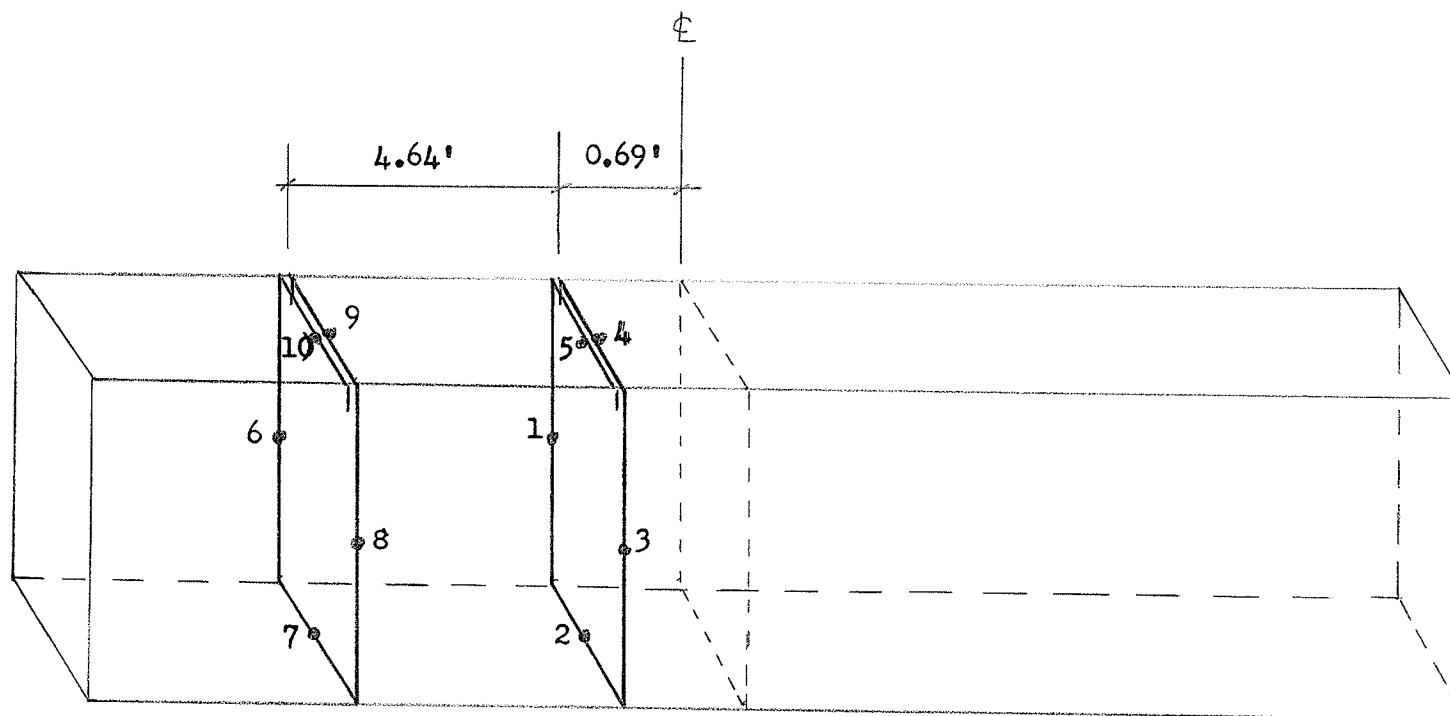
Position of the strain gauges on two stirrups in Beam III
